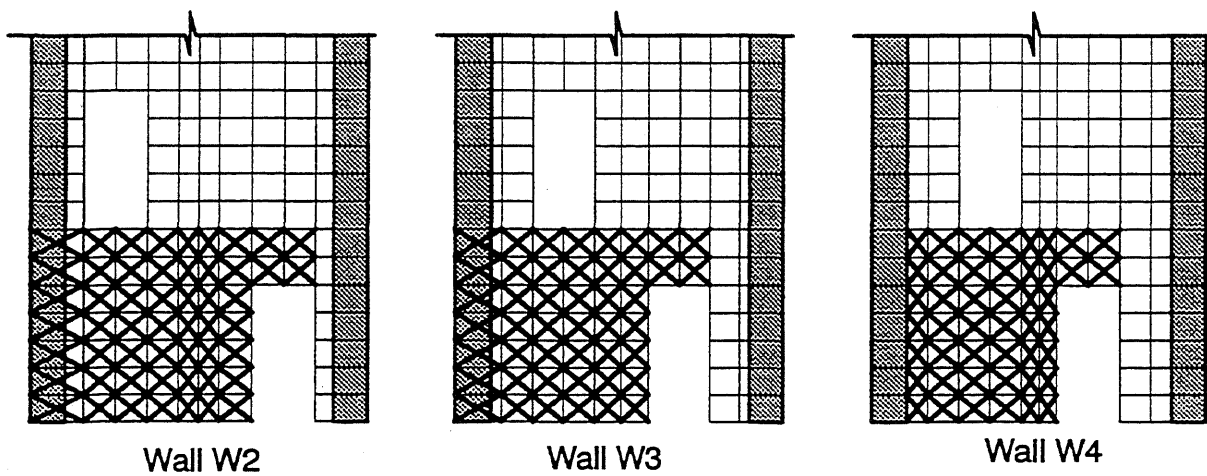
Diagonal Reinforcement in Walls W2, W3, and W4
